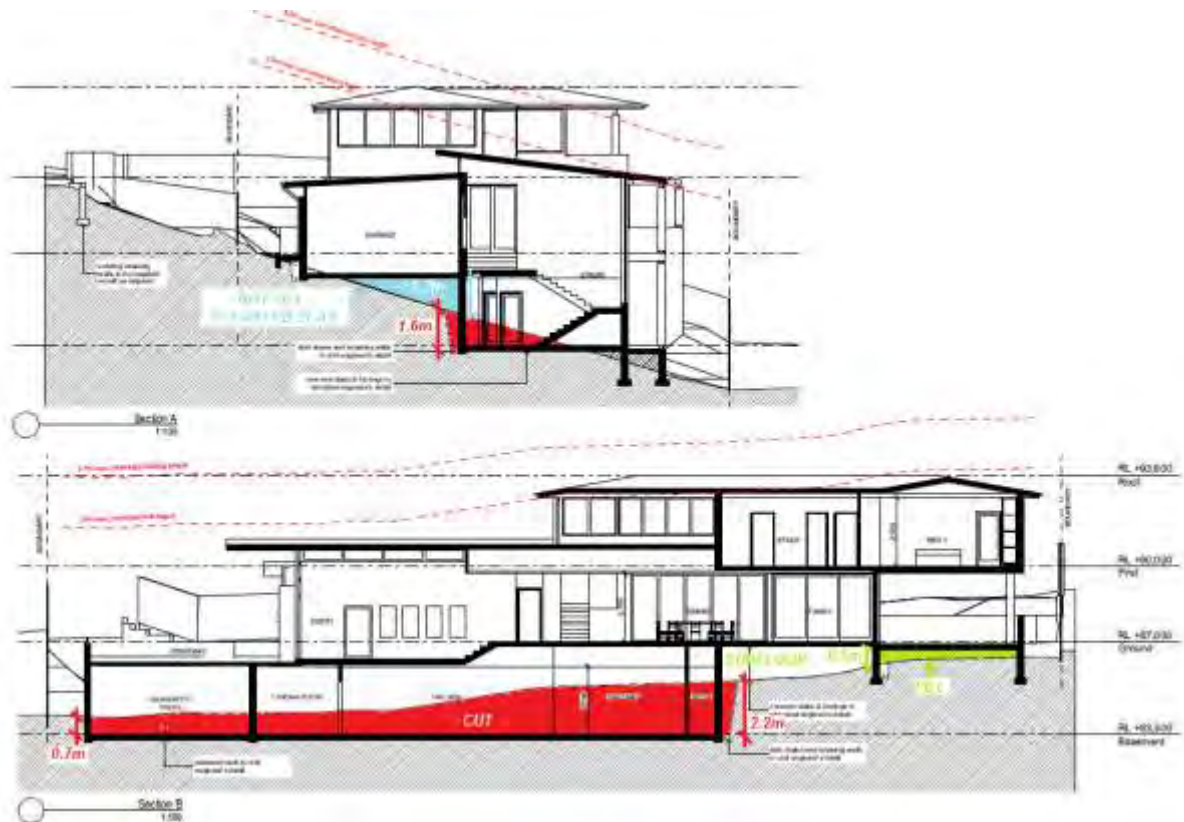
Long & short sections of proposed dwelling showing extent of cut & fill
